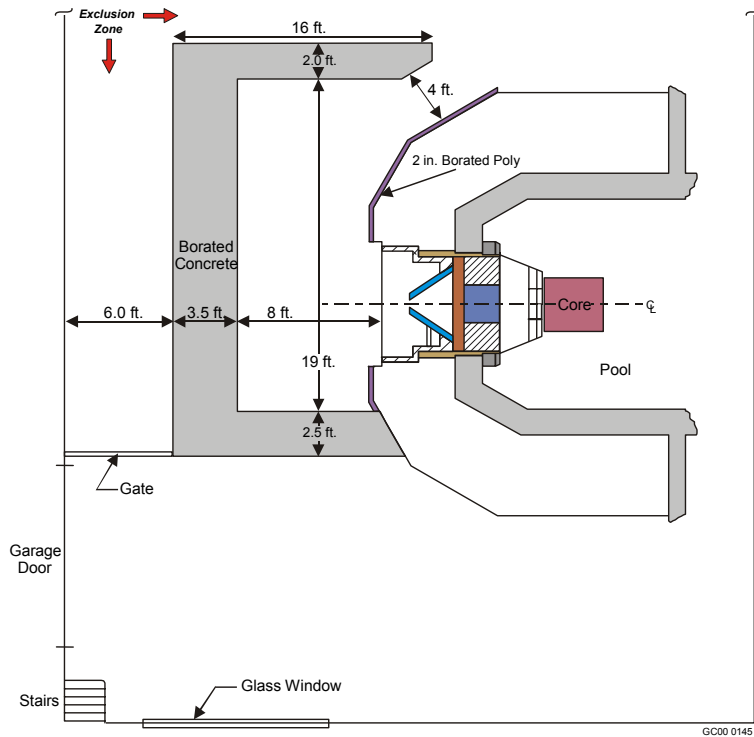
Final thermal column shield (water-filled door) and adjacent floor area at the WSU TRIGA facility prior to modifications.
